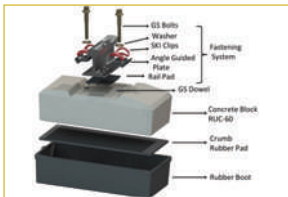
Typical Sketch: Twin booted block system of BLT in Tunnels
